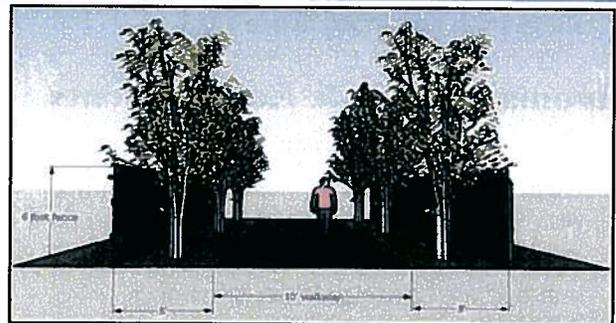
Rendering showing the standard design of a pedestrian/bike connection. The design incorporates a 10' walkway, 5' landscaping on either side, and fencing.
